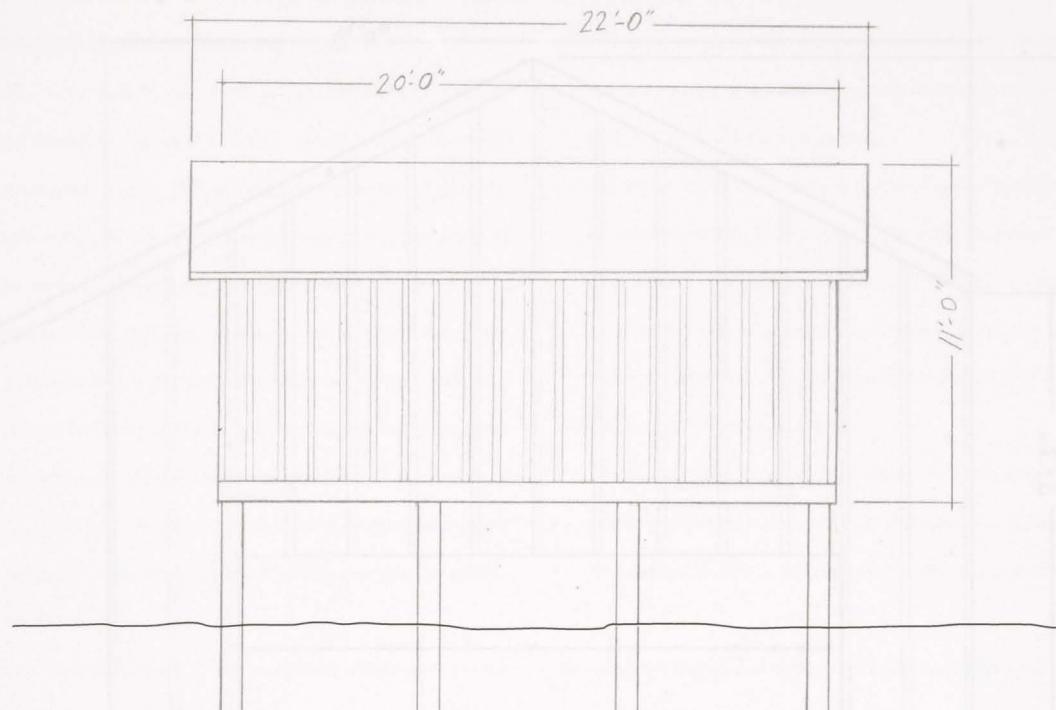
Wendel boathouse, east elevation, 1/4"=1'-0", water level changes. Drawing by L.Over
